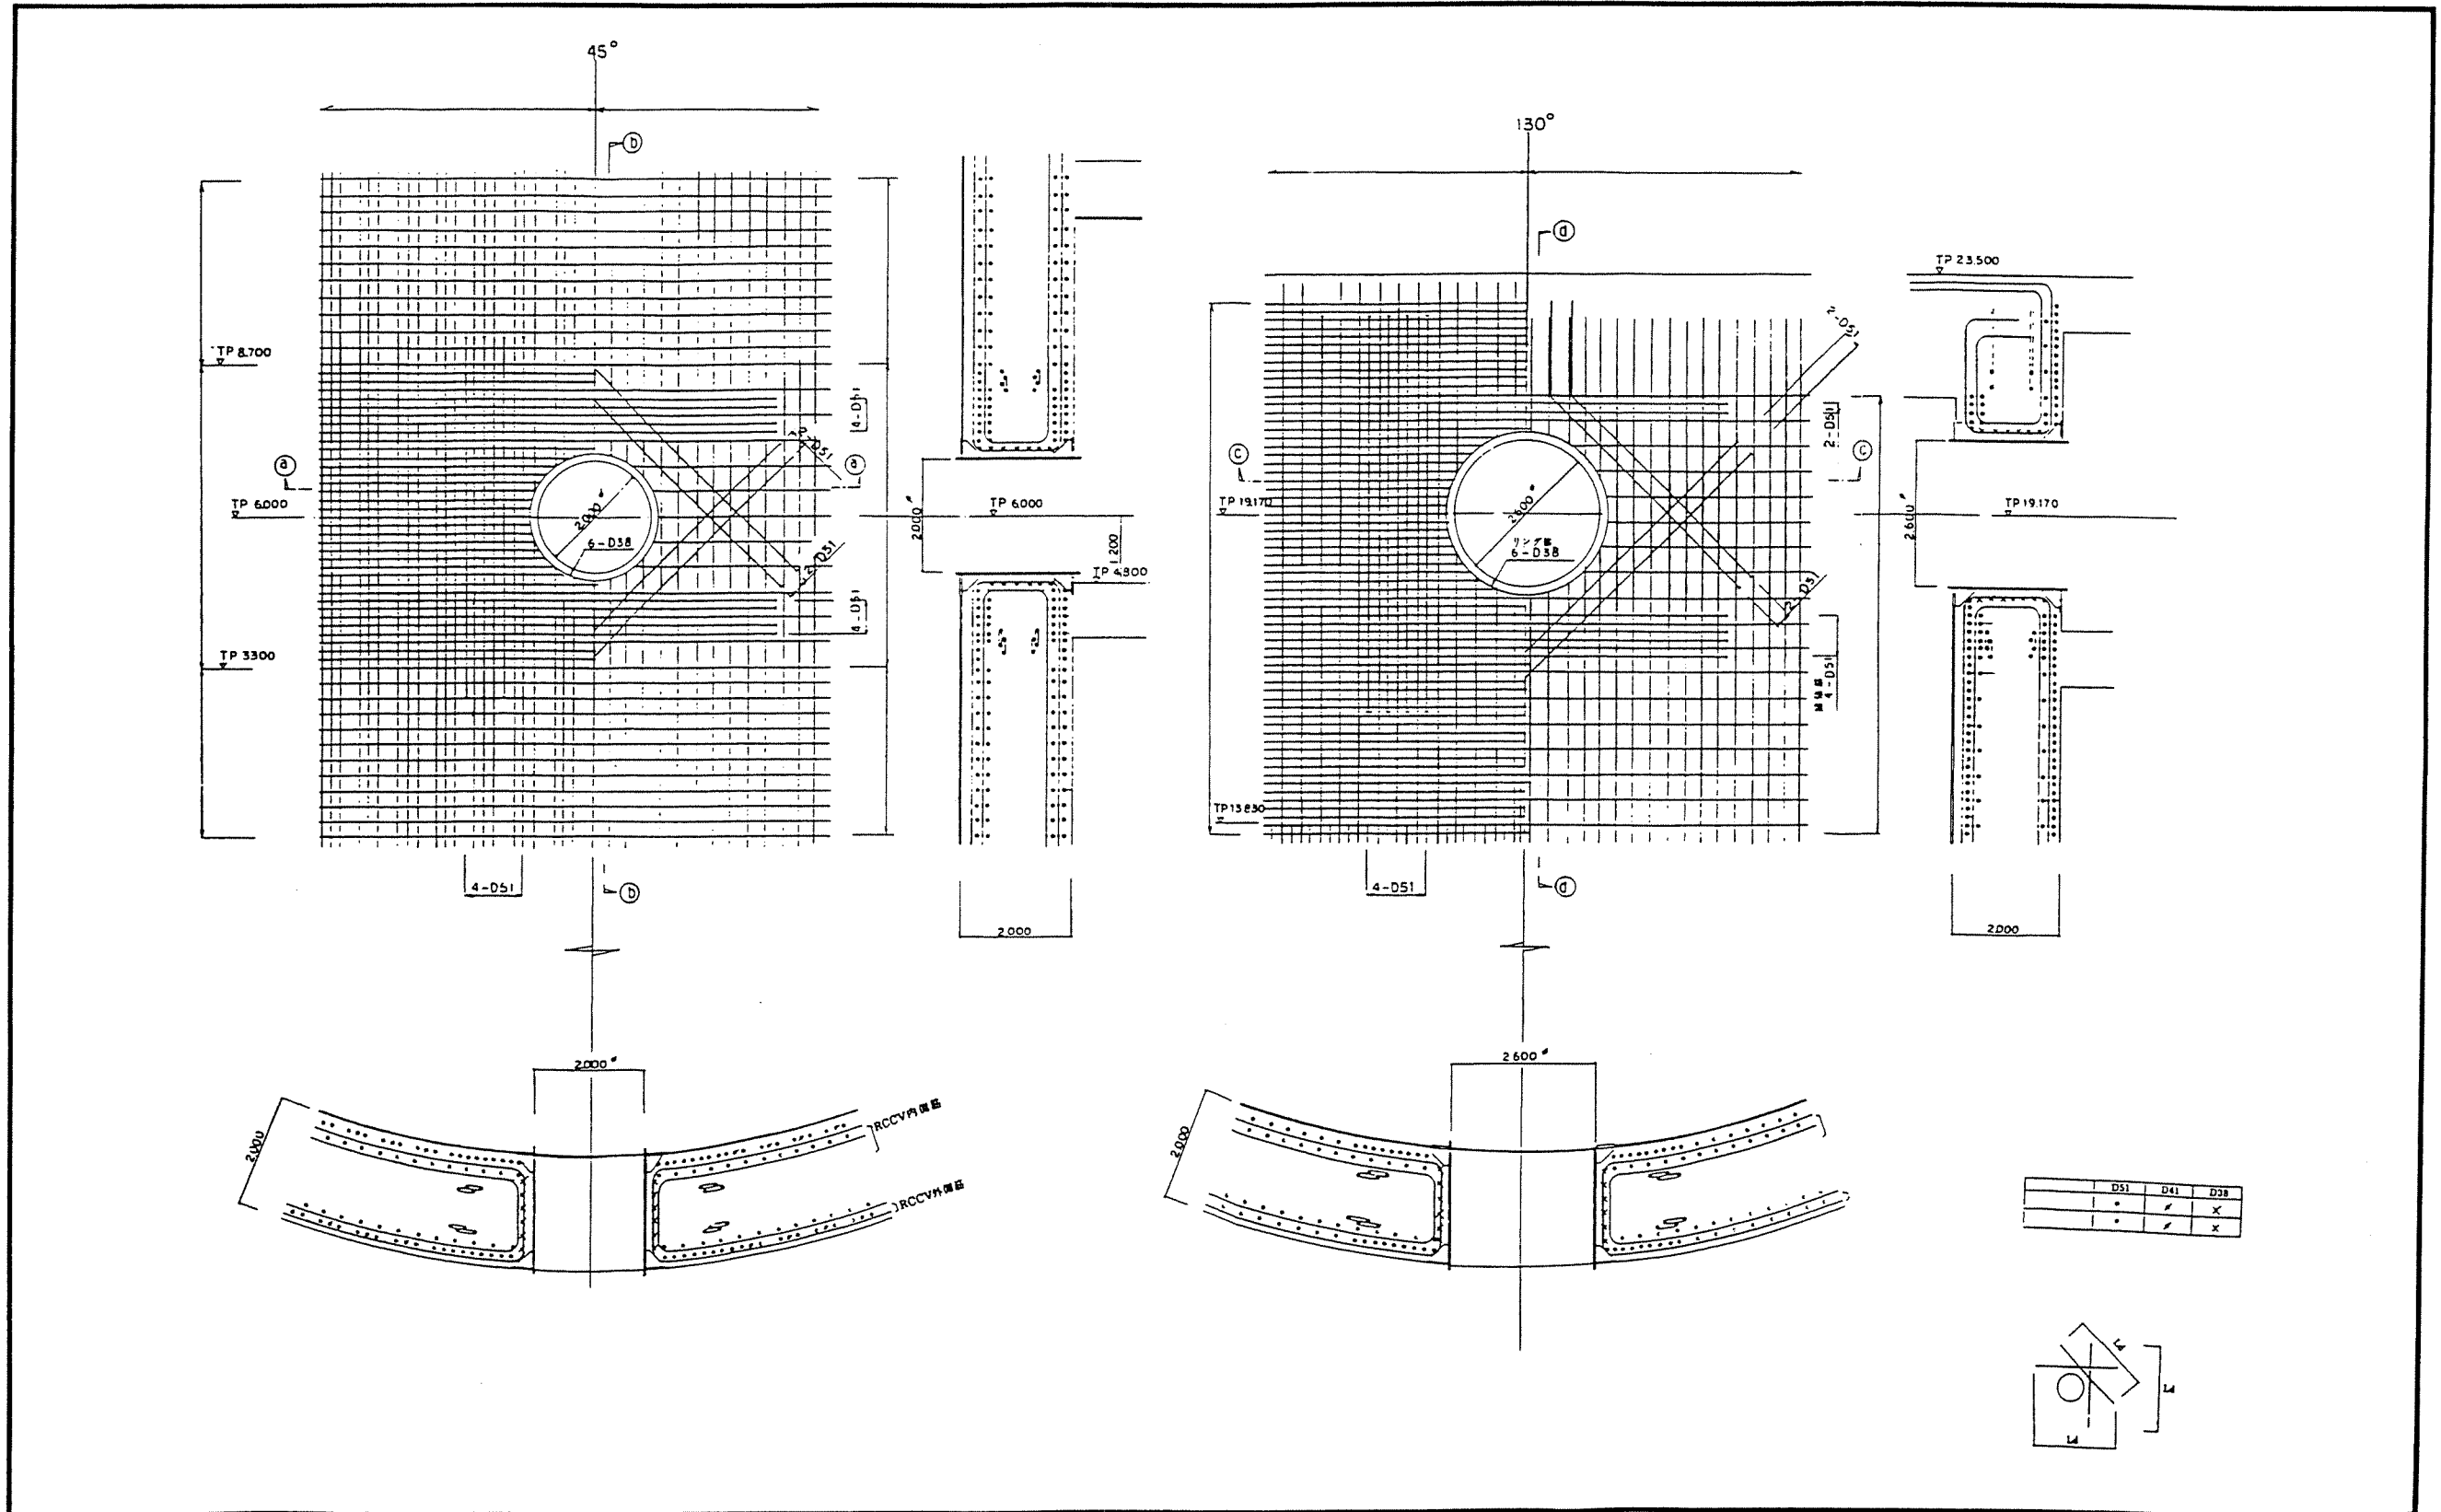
H.1-31 CONTAINMENT STRUCTURE OPENING REINFORCEMENT
